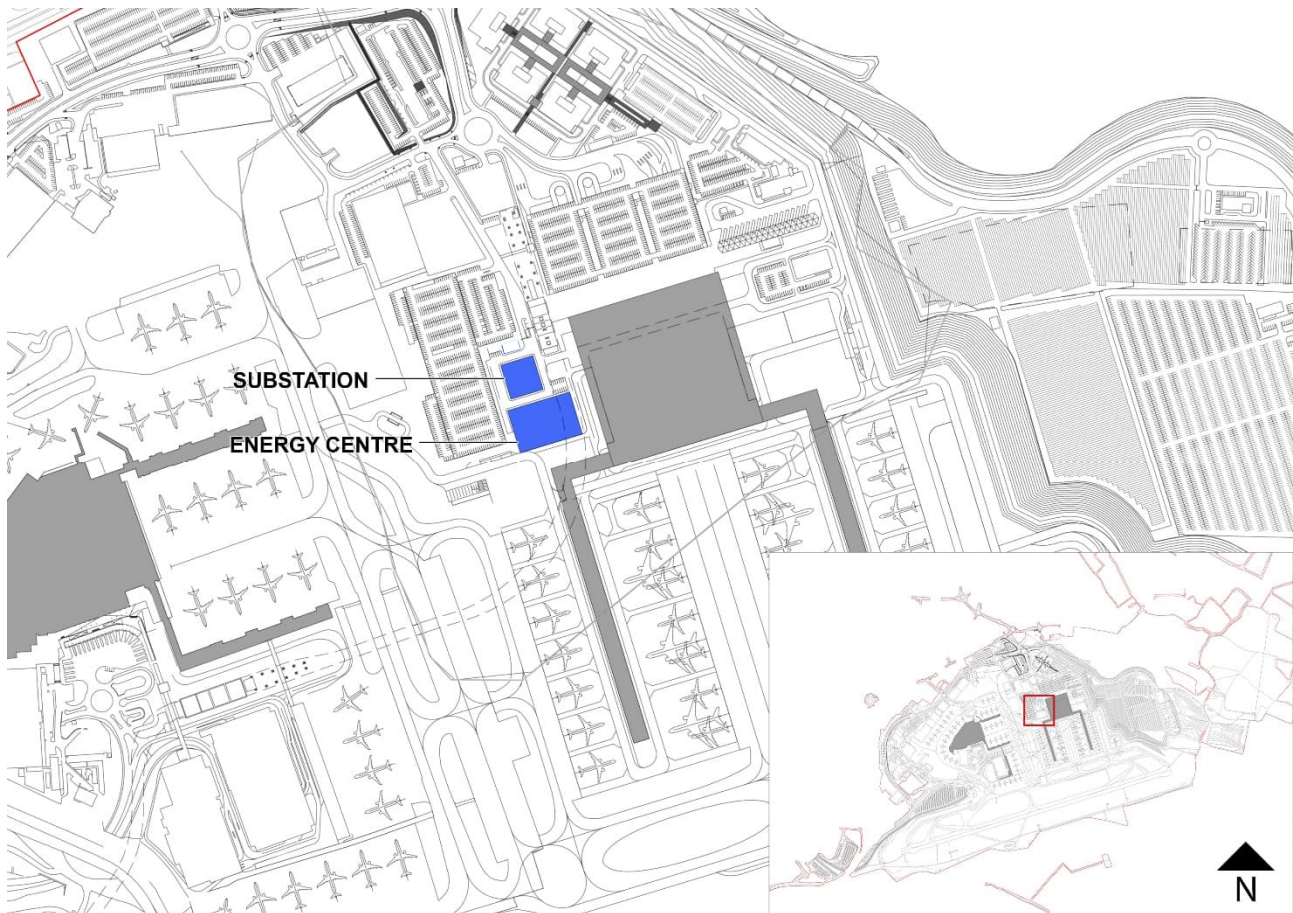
Proposed Support Buildings Plan (*indicated in blue*)
